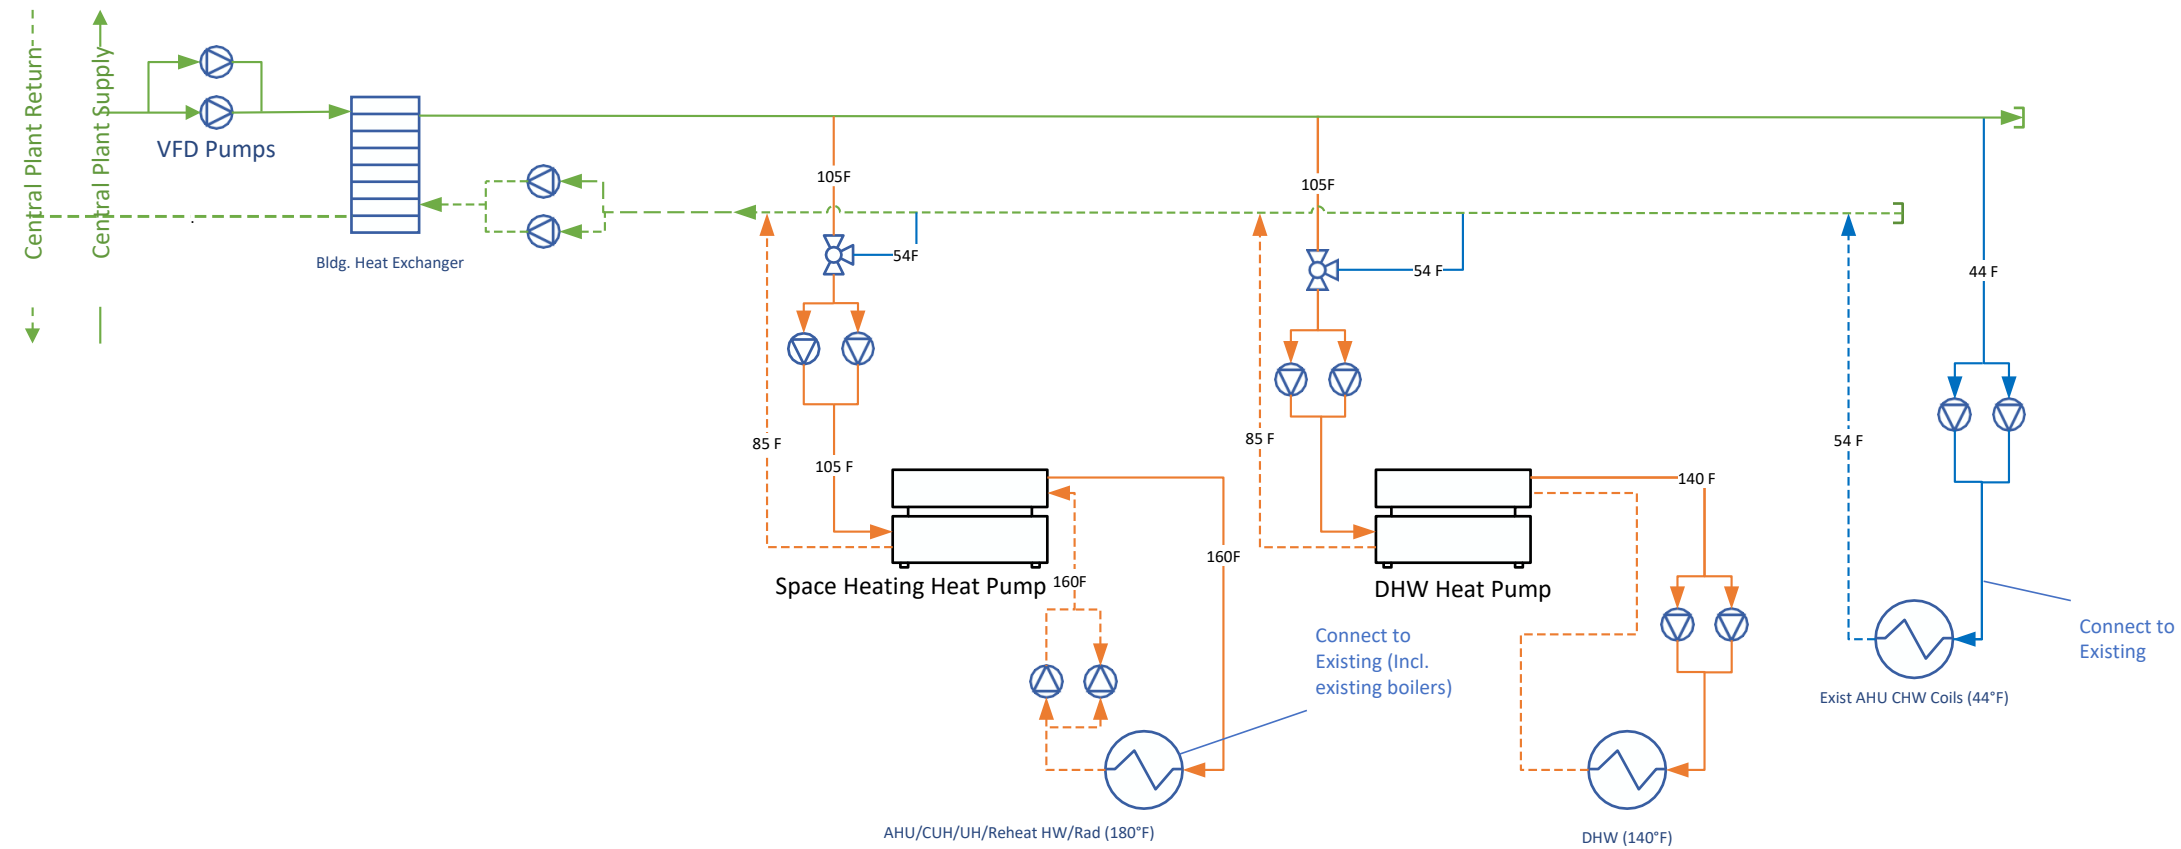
Chamberlain Center Piping and Instrument Diagram
